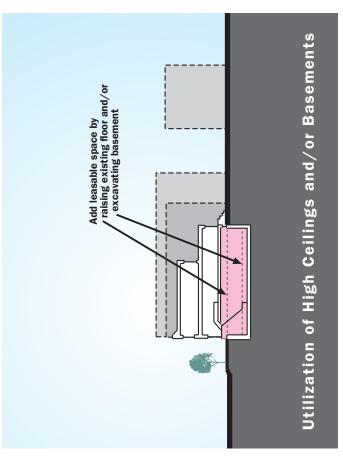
A.26: Diagrams showing addition of leasable space to existing buildings
